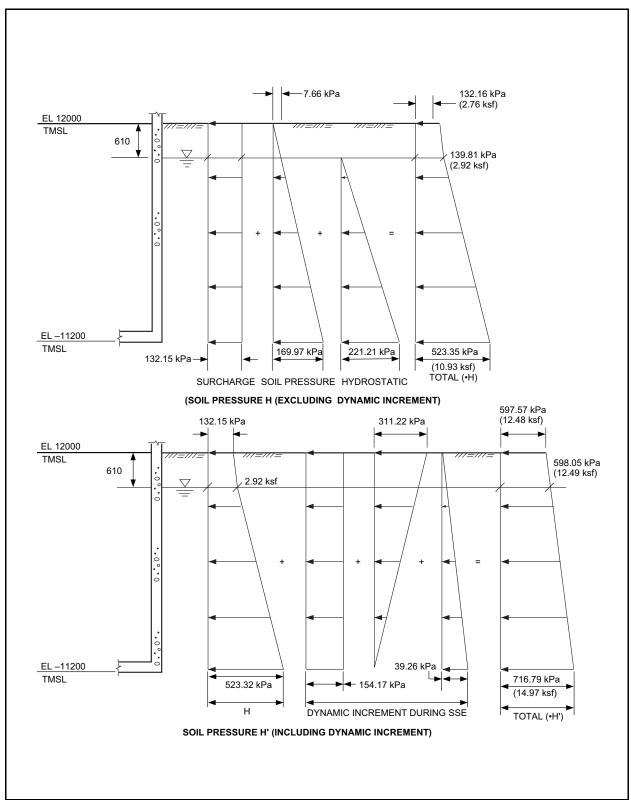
H.2-14 At Rest Lateral Soil Pressures on Walls (H and H')
